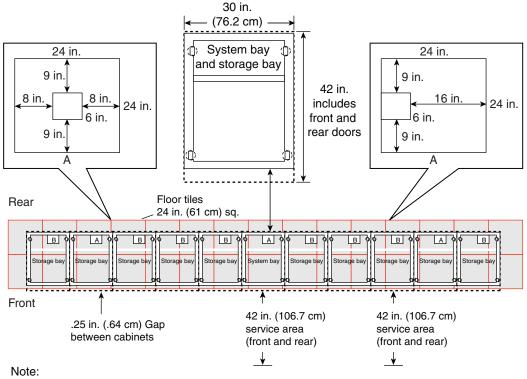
on page 51 shows the standard layout of a fully loaded Symmetrix system with standard bays on a raised floor with tile cutouts.
